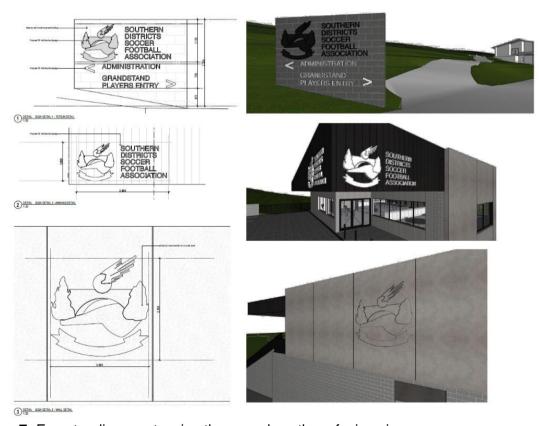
Freestanding, eastern/northern, and southern facing signage.
